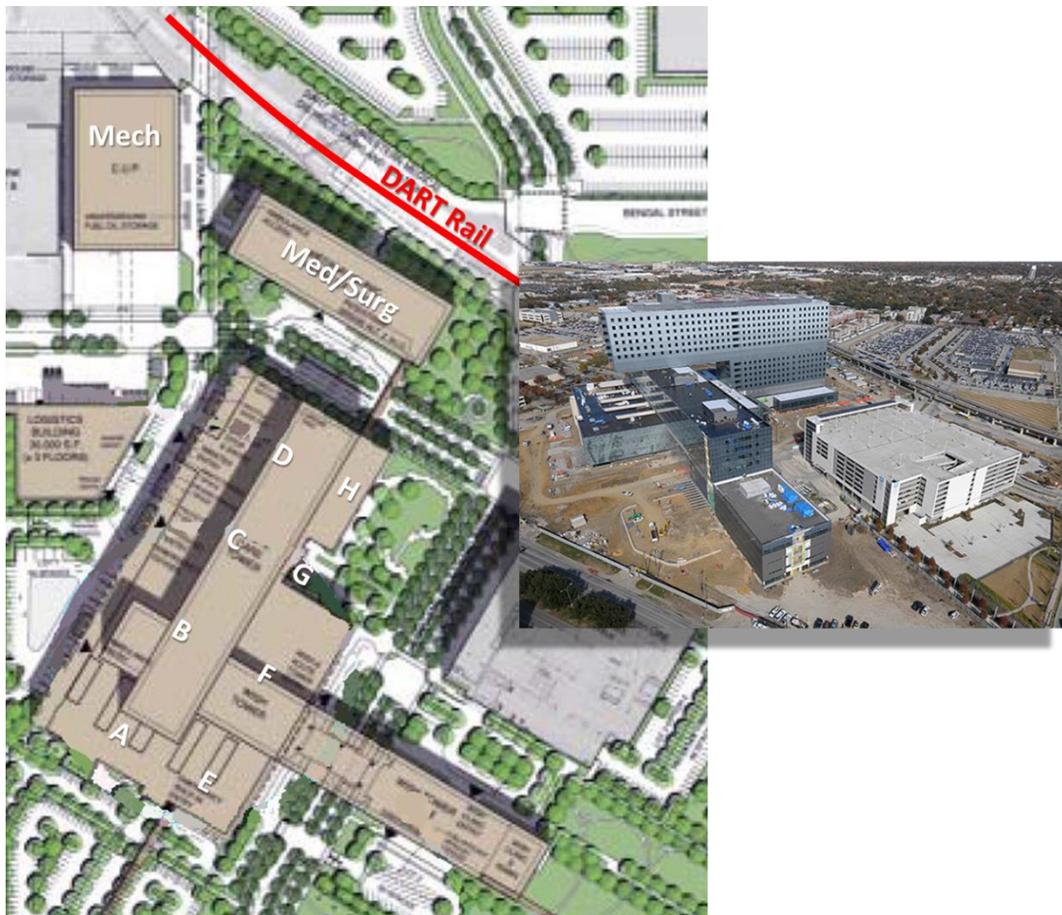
The New Parkland Hospital Site and Room Section Key Plan.
